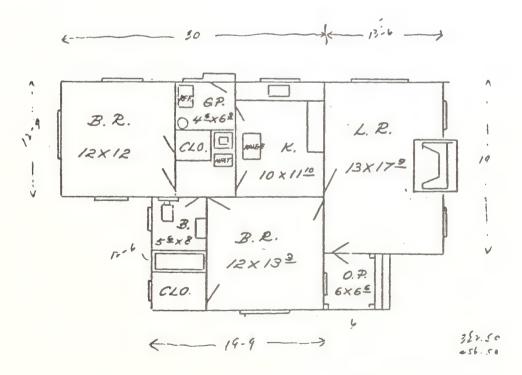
Ranger Residence Floor Plan (late 1960s-early 1970s).
